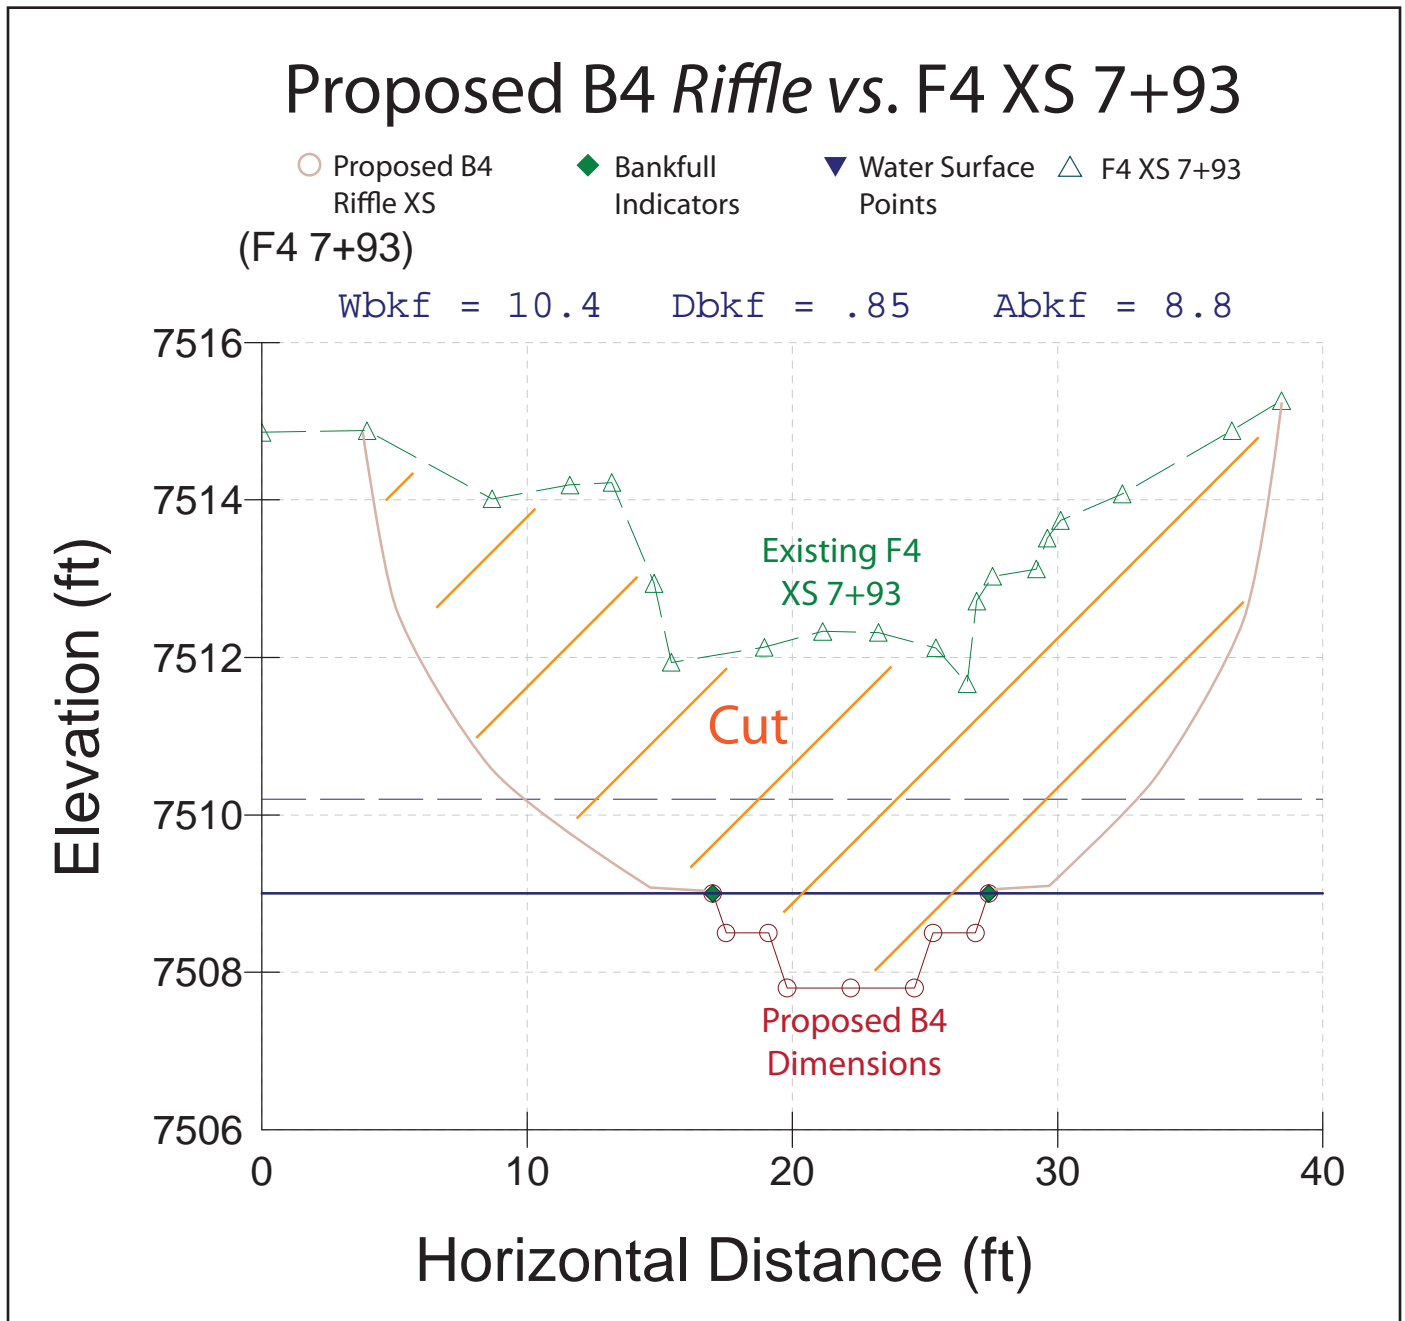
The proposed B4 *riffle* cross-section compared to the existing F4 cross-section 7+93, indicating the substantial excavation required.
